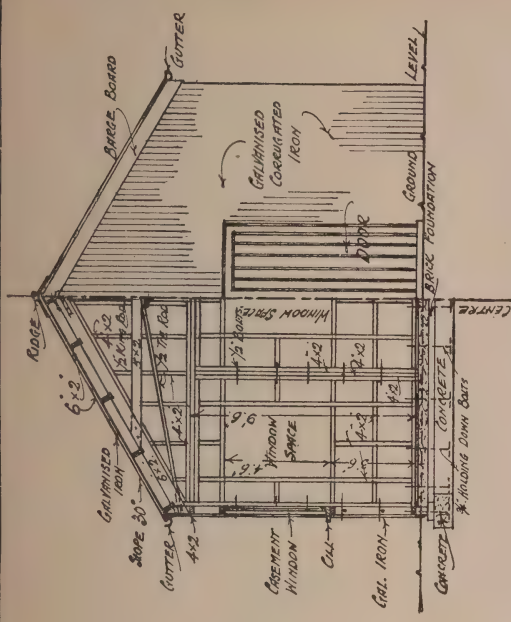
Half End Elevation and Half Section of Portable Workshop
